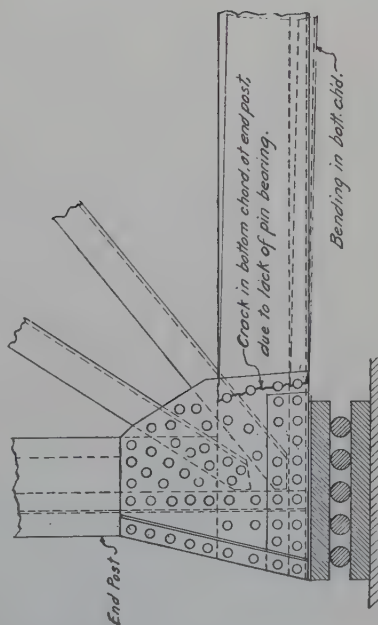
SKETCHES OF FAULTY DETAIL
